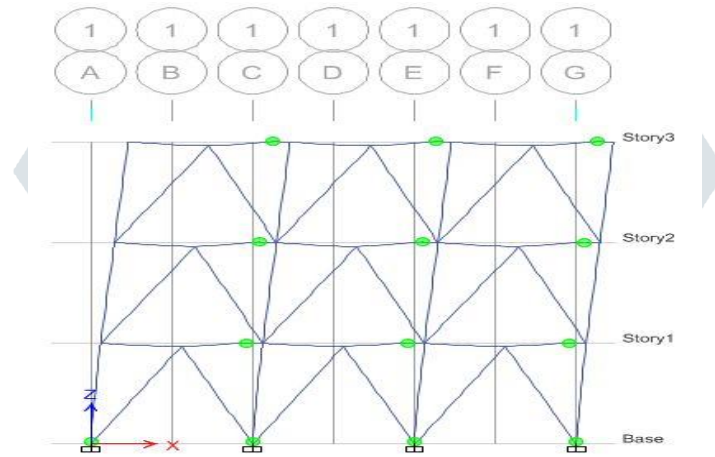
Hinges formed in one story height Inverted V Braced frame structure.
